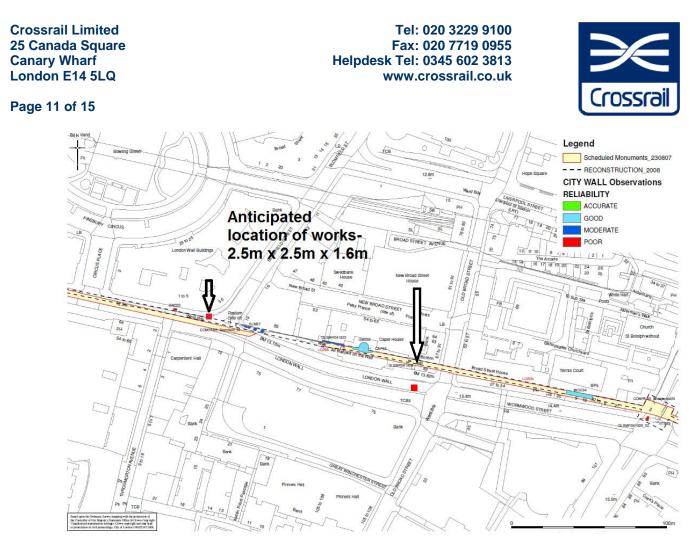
Location of trial pit North side of London Wall (left Blomfield) and outside 82 London Wall (right) to expose 36" gas main
